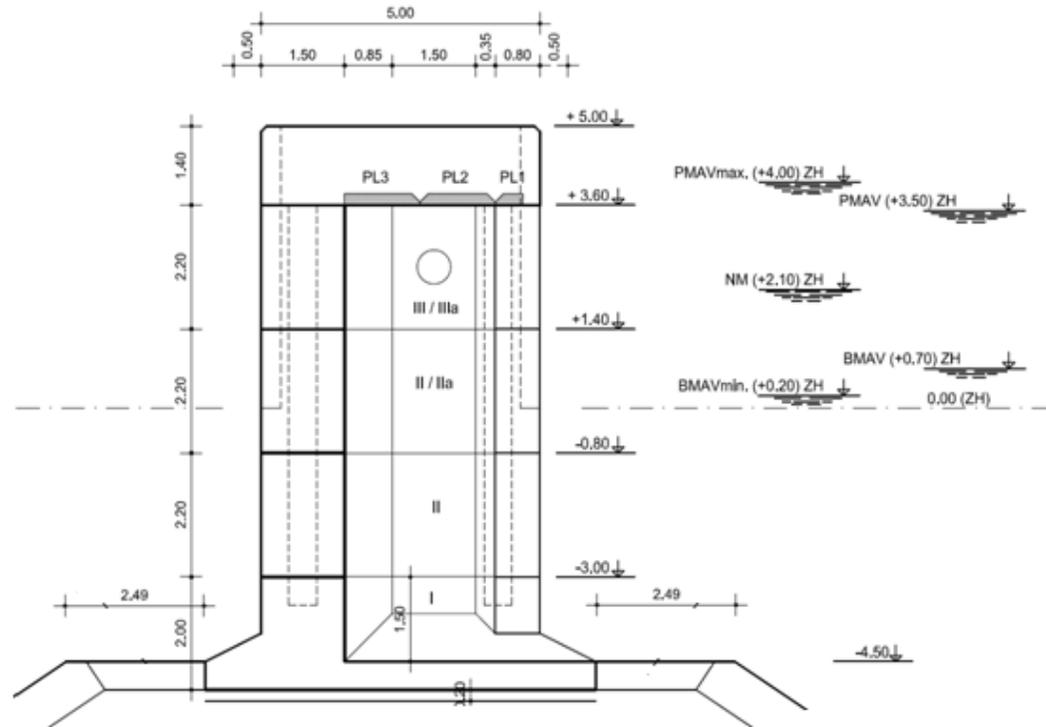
Section of the initial idea proposed by project where the gravity wall is built with precast blocks
